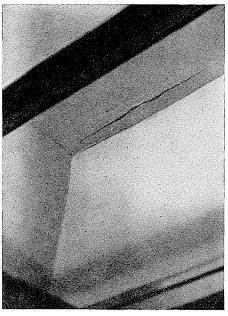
Damage Caused to Ceiling Above Entrance by Spreading of Rafters Under Snow Load.
